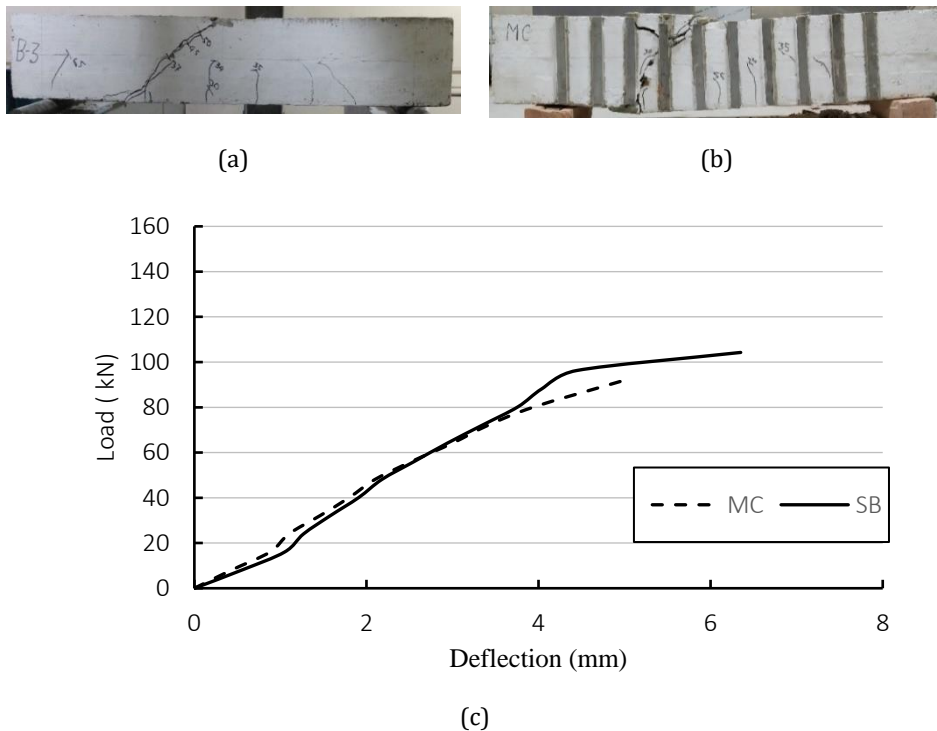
(a) Damaged beam for MC, (b) Failure mode of beam MC, (c) Deflections of beams MC and SB
